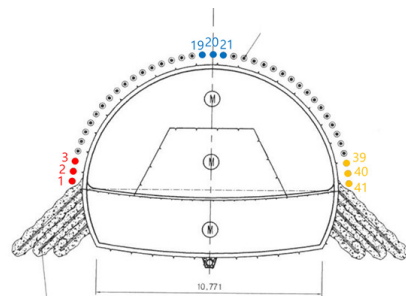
Improved Steel Pipe Multistep Grouting Method Construction Plan
